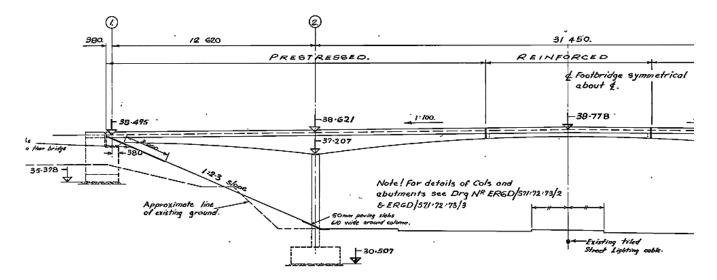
Elevation of bridge (Extract from Record Drawing ER6D/S73/1)
